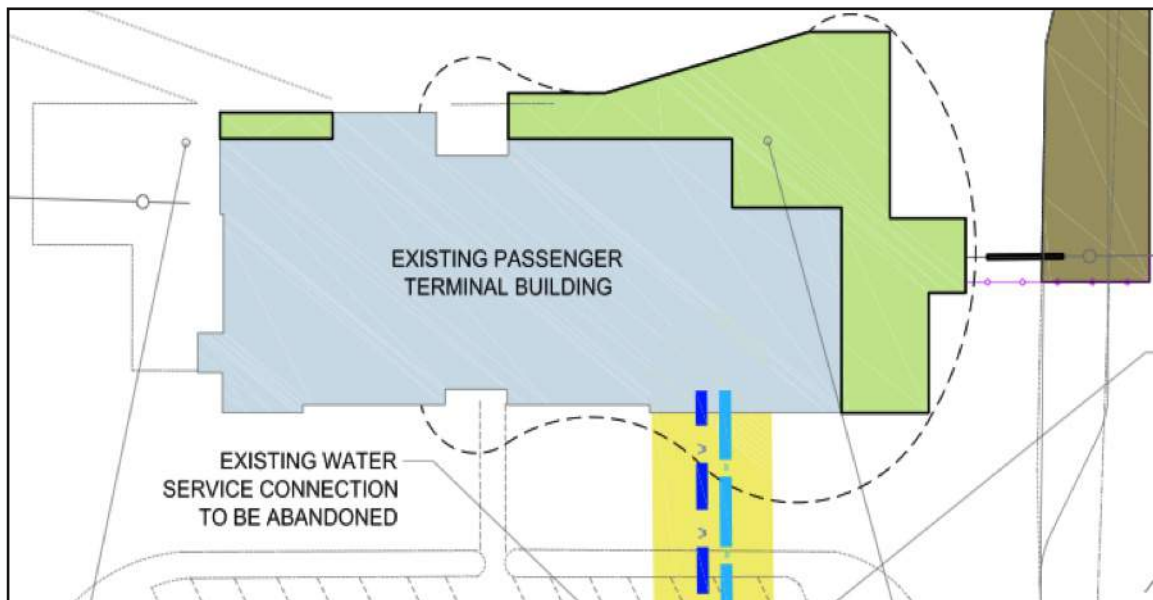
Proposed expansion for air terminal building with new roof areas shown in green.
